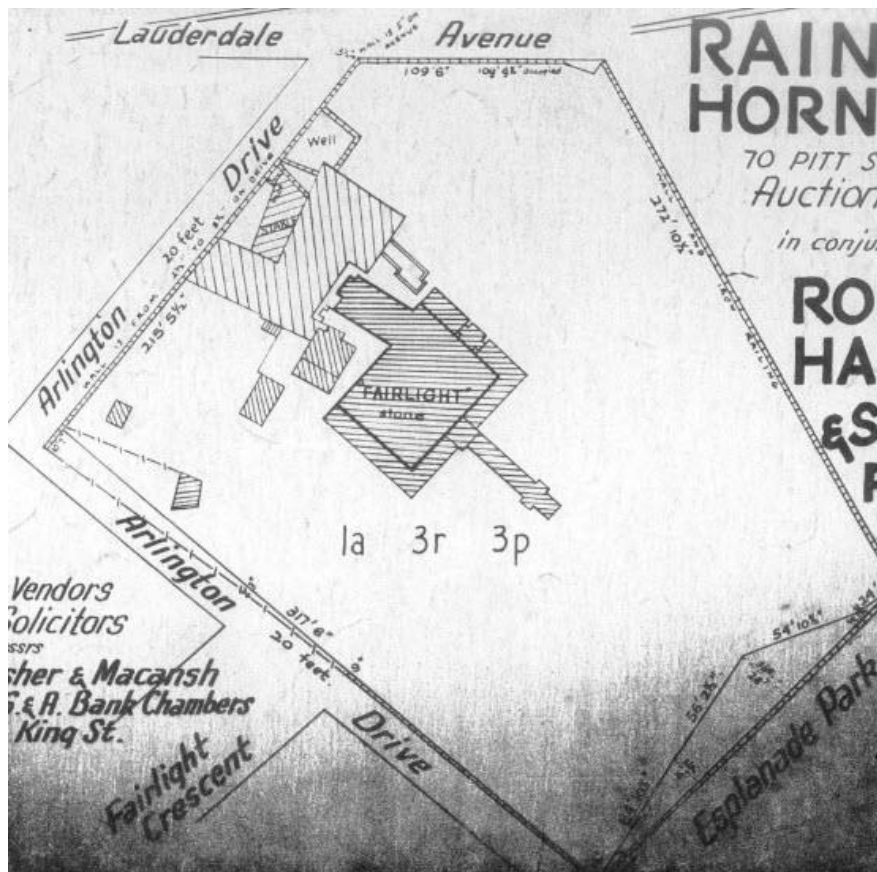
Fairlight House site plan c.1938. Source: Northern Beaches Council
